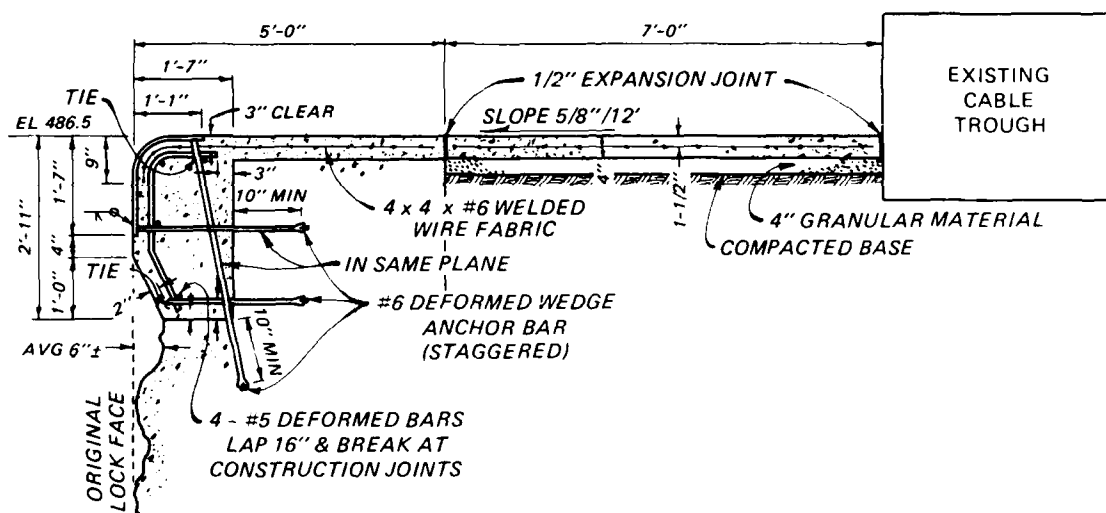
Typical resurfacing and corner armor installation details, 1965, Marseilles Lock
